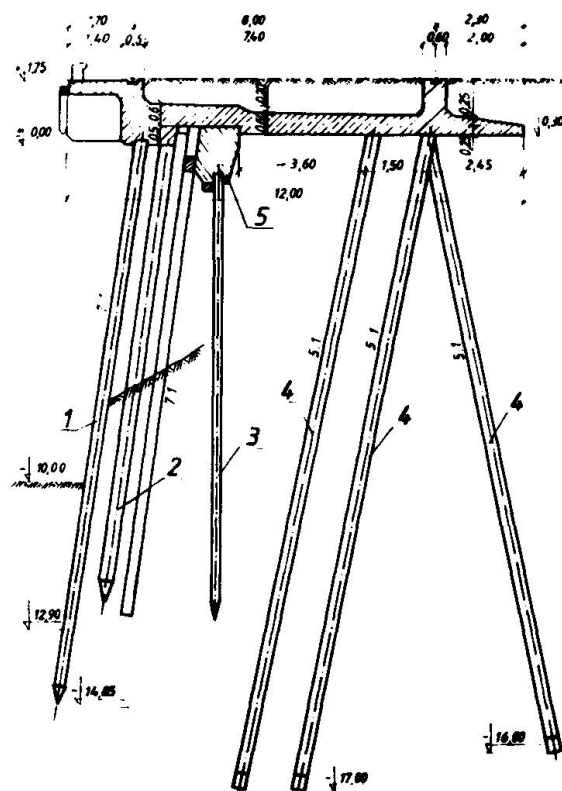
Strengthening of the berthing structure of the Vistula Terminal in Gdańsk [3]: 1-concrete sheet wall, 2-existing timber piles, 3-existing timber sheet wall, 4-concrete piles, 5-existing concrete coping beam
